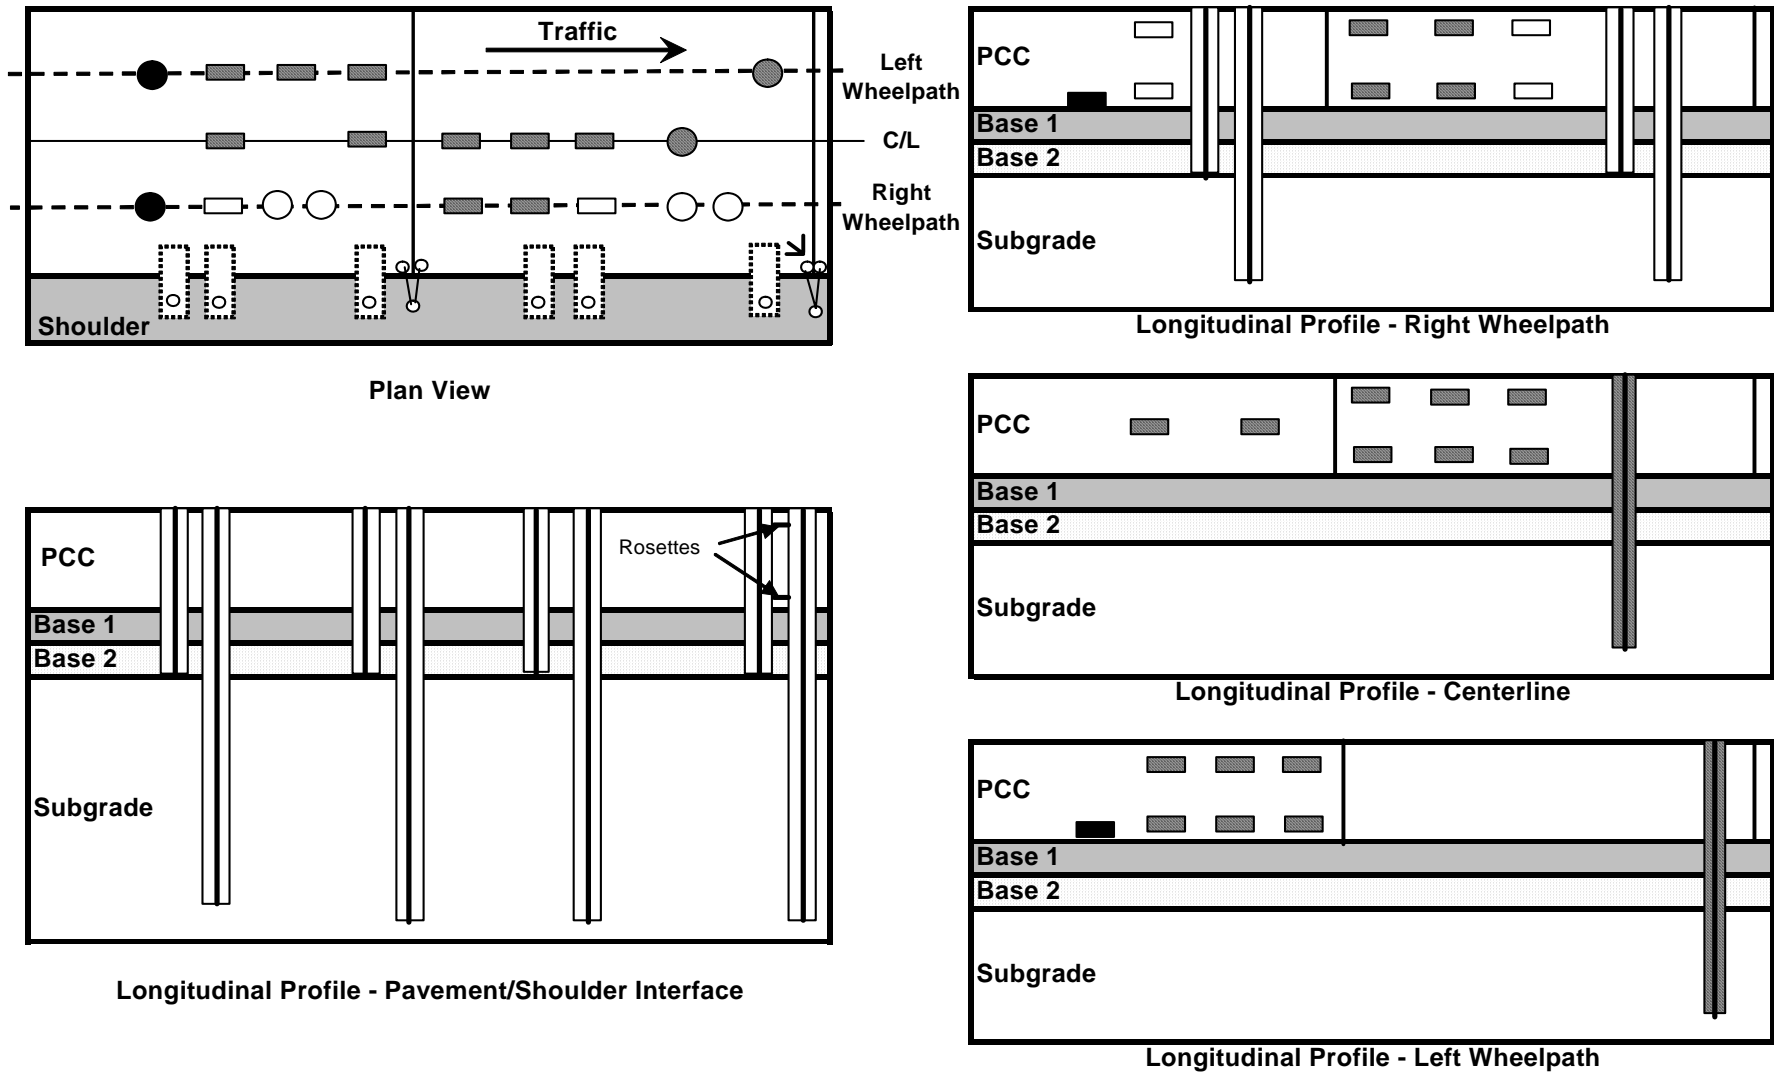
Typical Instrumentation Placed in PCC Pavement Sections
